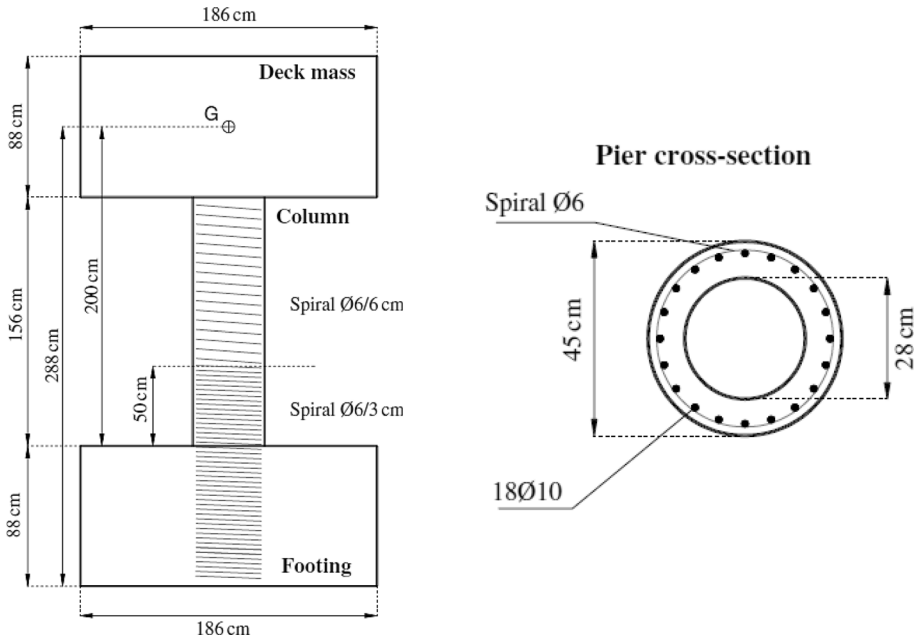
Configuration of hollow section bridge pier specimen (Petrini et al. 2008)
